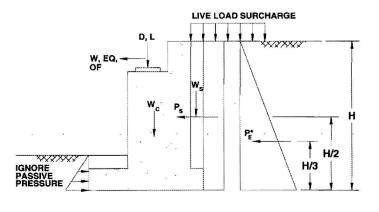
TRACK PARALLEL TO SUPPORTING STRUCTURE
